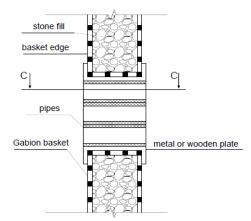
Vertical Section in the level of pipes Source: Designed and drawn by the author Section in the level of pipes
